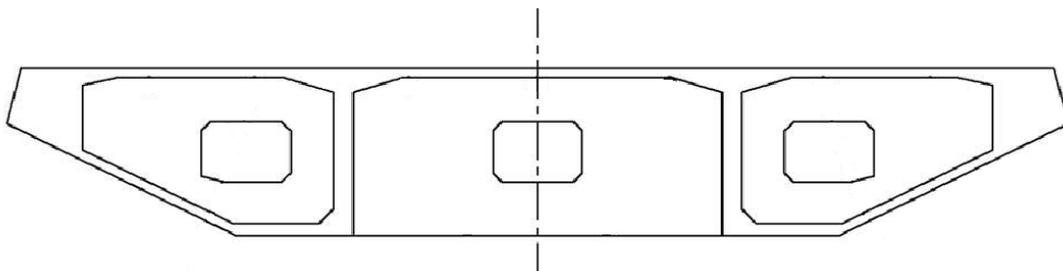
The main girder is a box girder. It has two closed chambers with trapezoidal shape.
